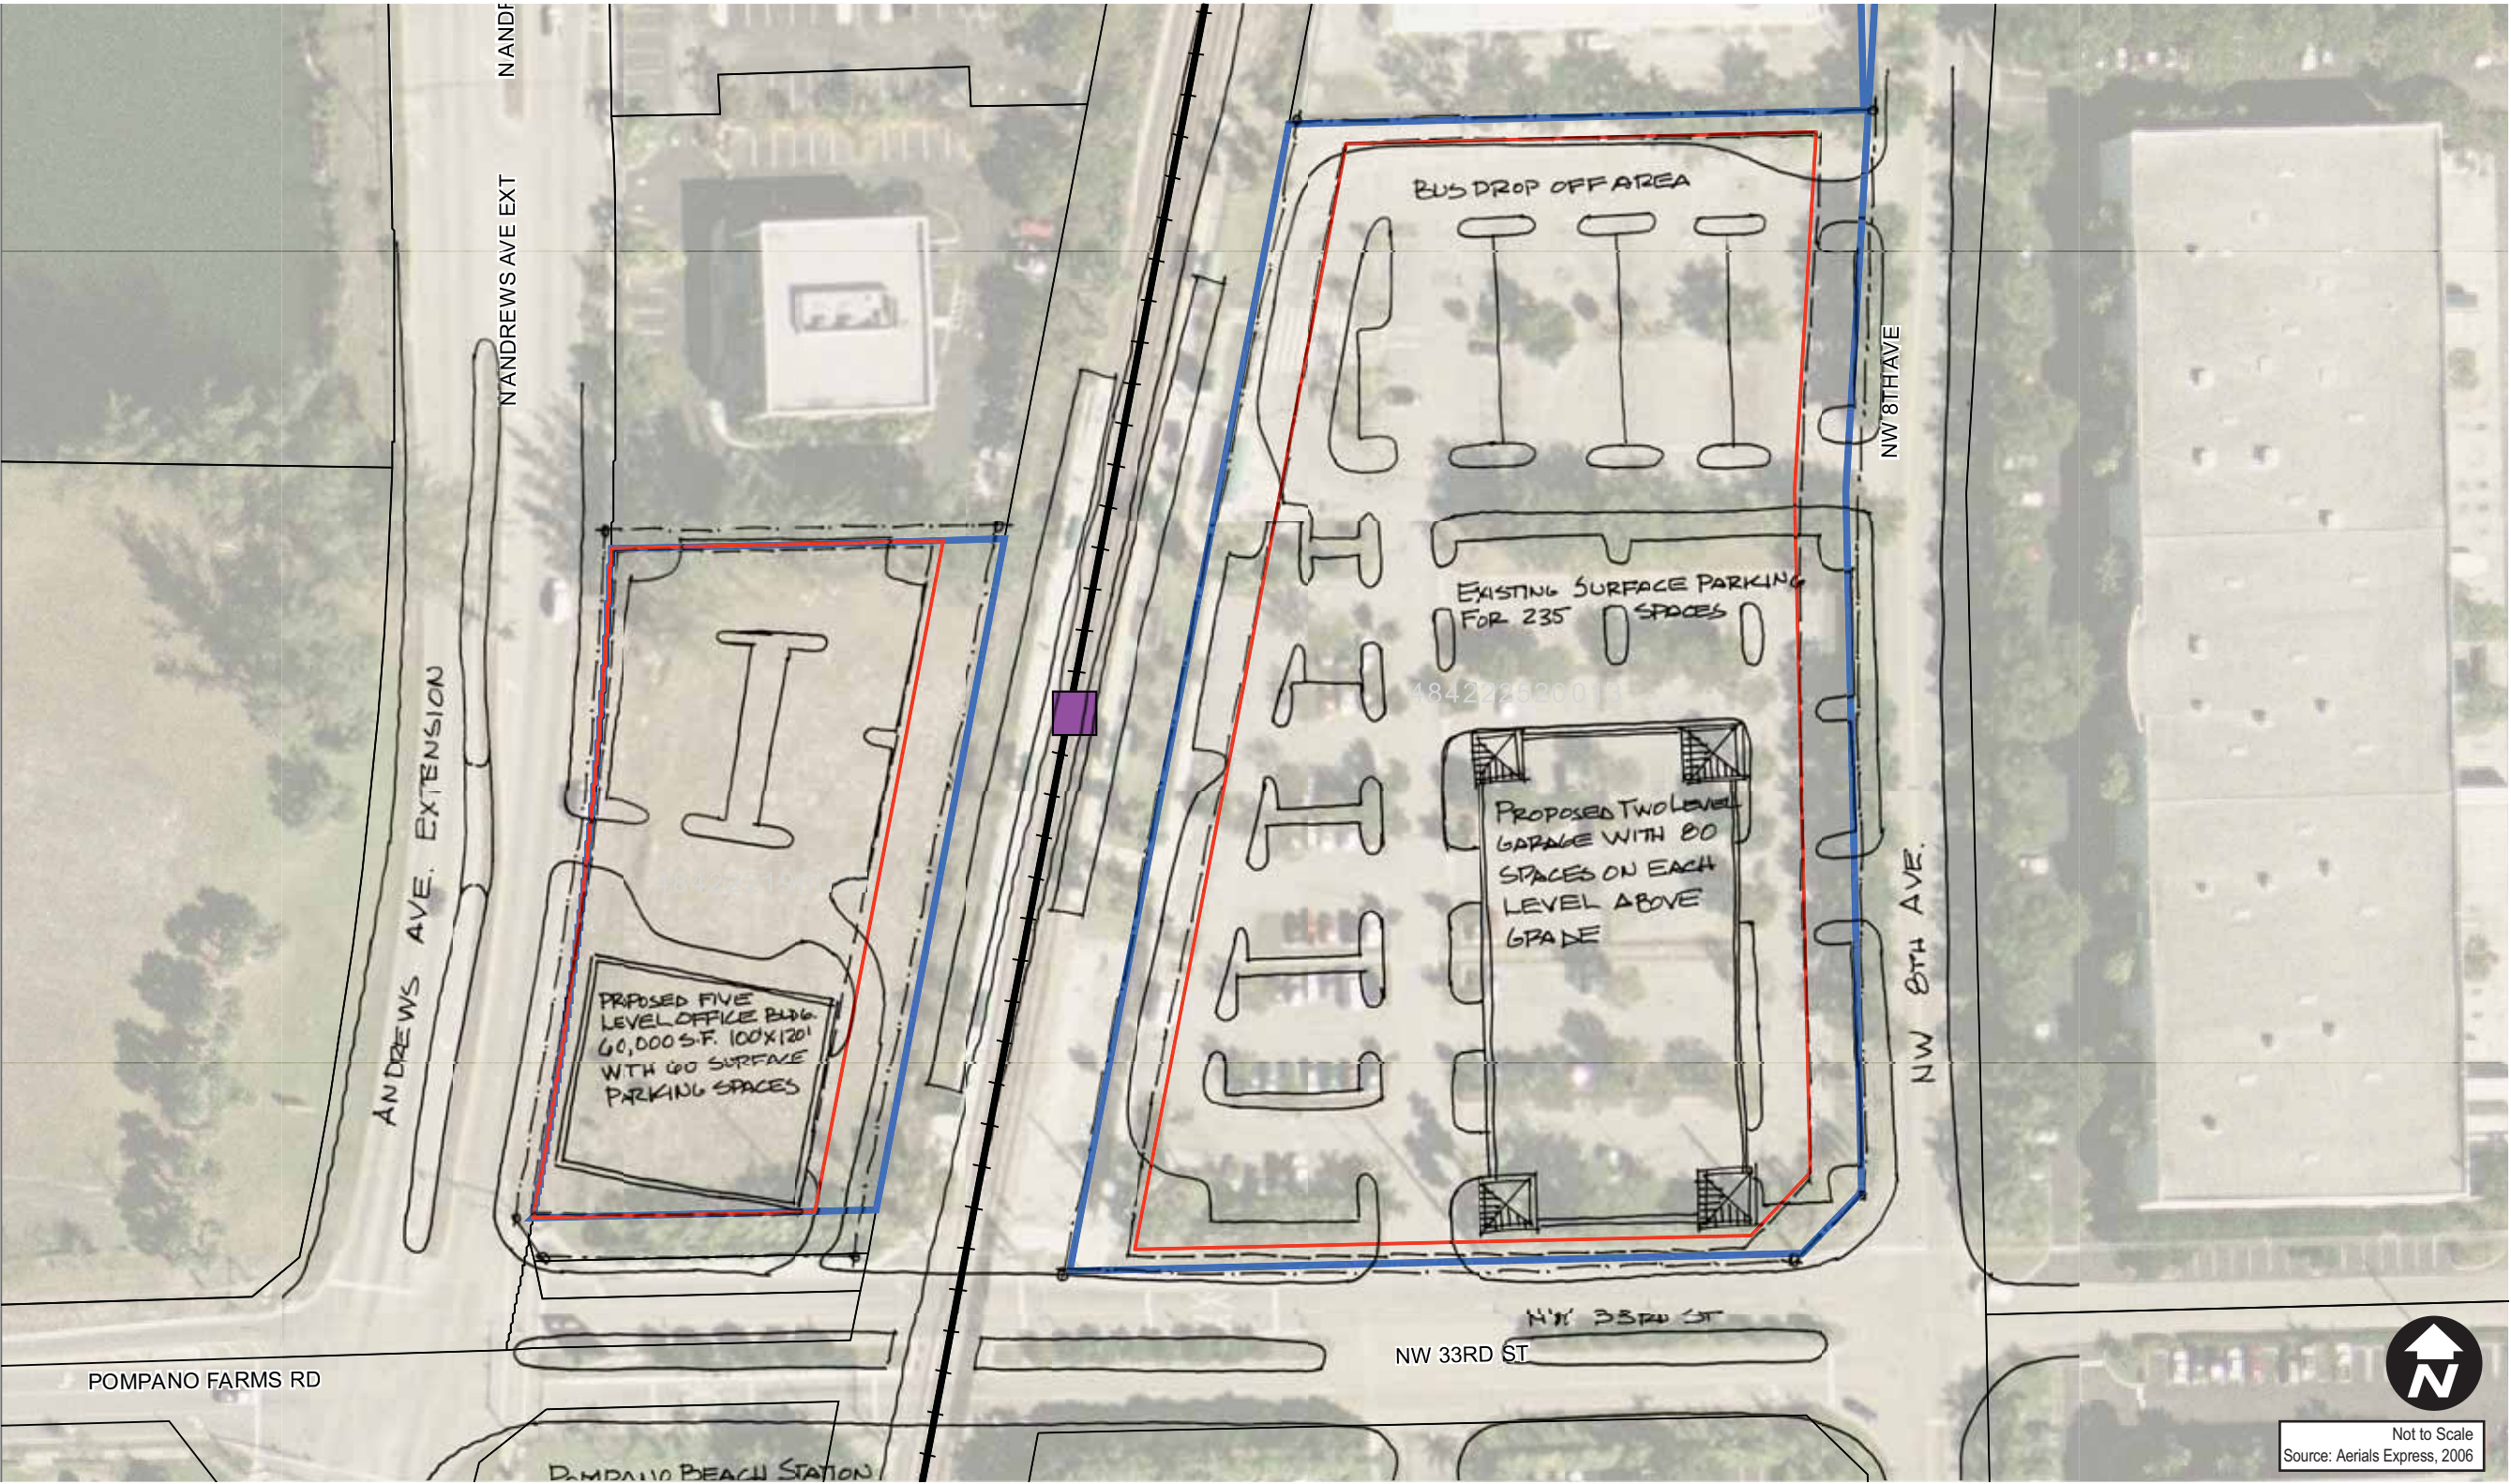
Pompano Beach West Site - Conceptual Site Plan
